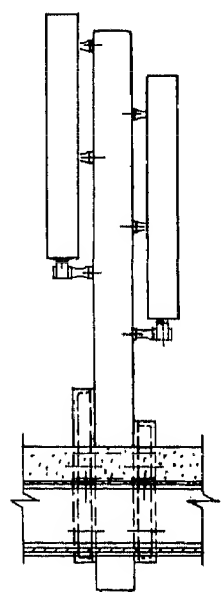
Elevation of Fig. 12: rectangular newel post.
